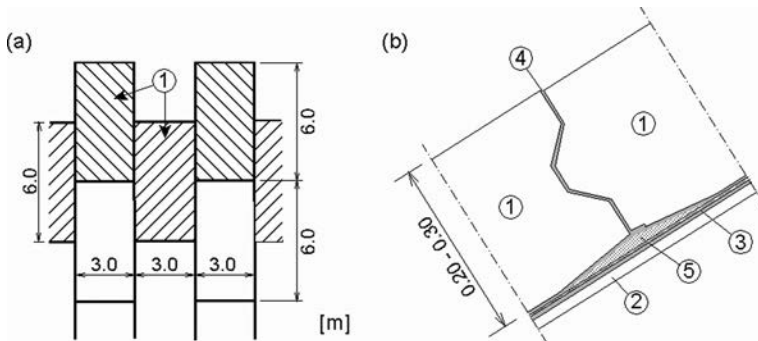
Bovilla dam. (a) Layout of the protective slabs; (b) horizontal joint between slabs (after CARPI, 1996 and Sembenelli P. and Sembenelli G., 2013). (1) Concrete slabs; (2) lean concrete base layer; (3) waterproof element – geocomposite; (4) single-layer geotextile; (5) foamed polystyrene wedge.
